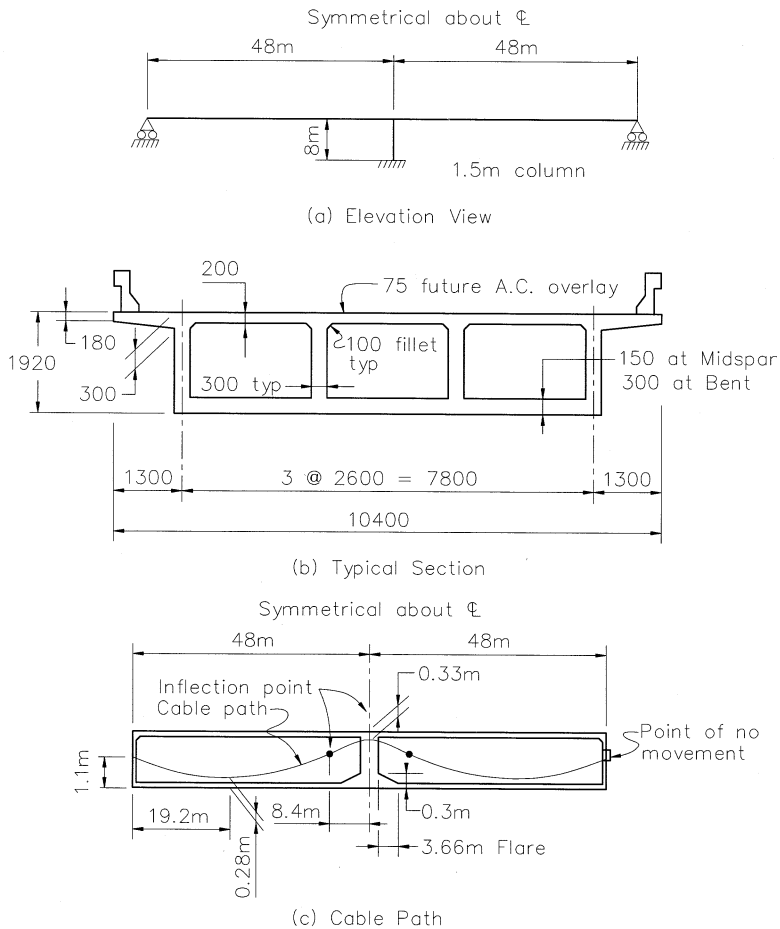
A two-span continuous prestressed concrete box-girder bridge.
